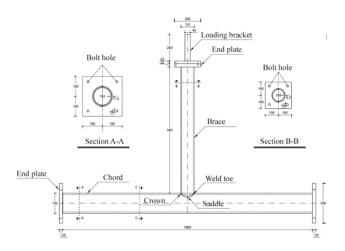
Overall configuration and dimensions of the steel tubular T-joint specimens (dimensions in mm)
